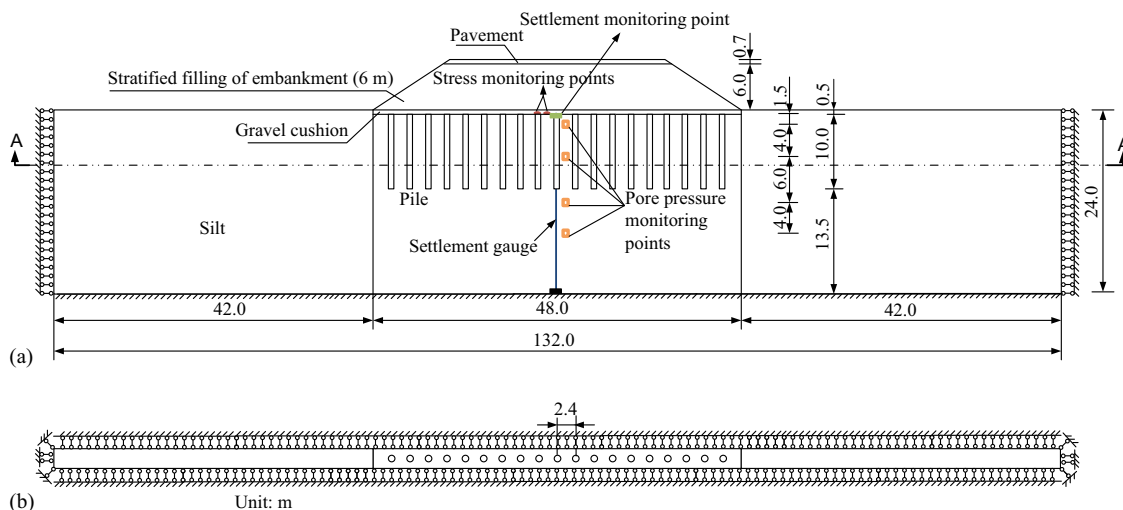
Cross section of the composite foundation and road embankment geometric model: (a) cross section; (b) Section A-A
